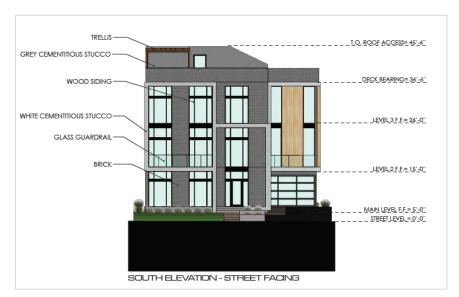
Proposed front façade after revisions. Revised façade gained a prominent front entrance and established better connections with adjacent structures.
